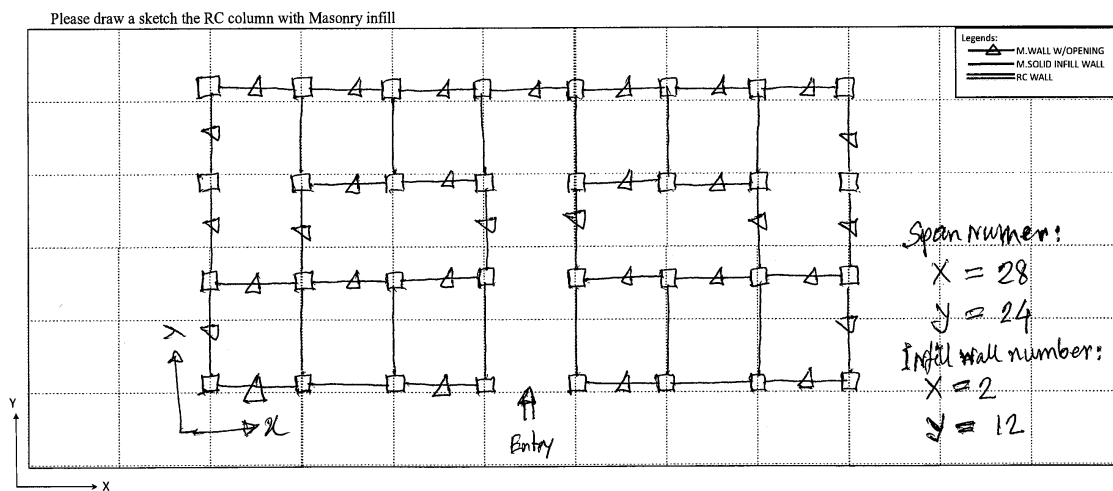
Rough sketch of the building showing Column layout and masonry infill walls with/without opening
